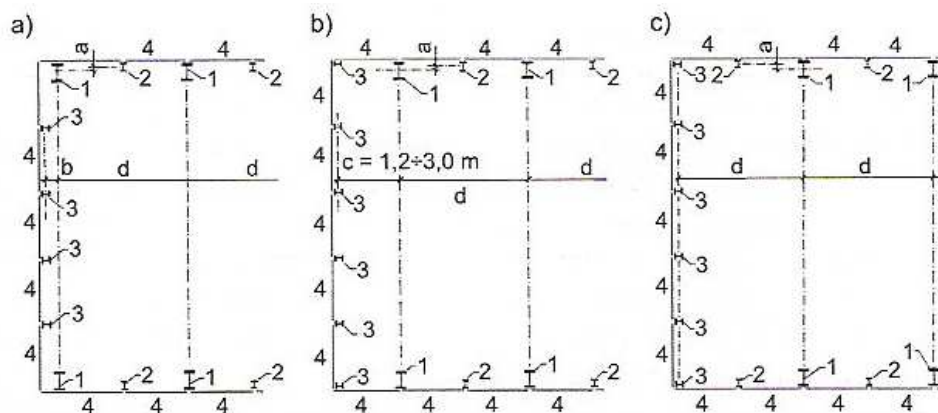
Schemes of the endwall to sidewall connection: 1- primary column, 2- secondary sidewall column, 3- endwall column, 4- wall girt
